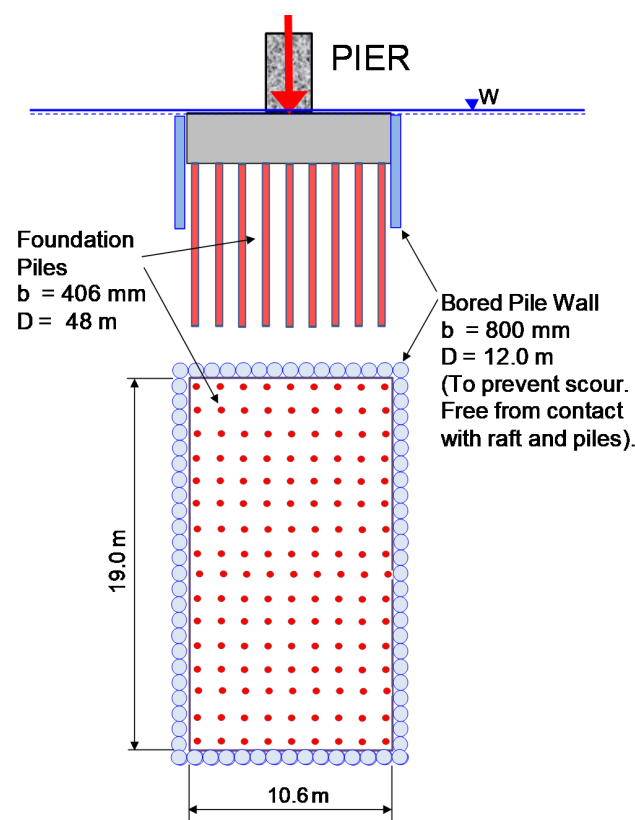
Piles for the Garigliano River Bridge. Section and plan (after Russo and Viggiani 1995)
